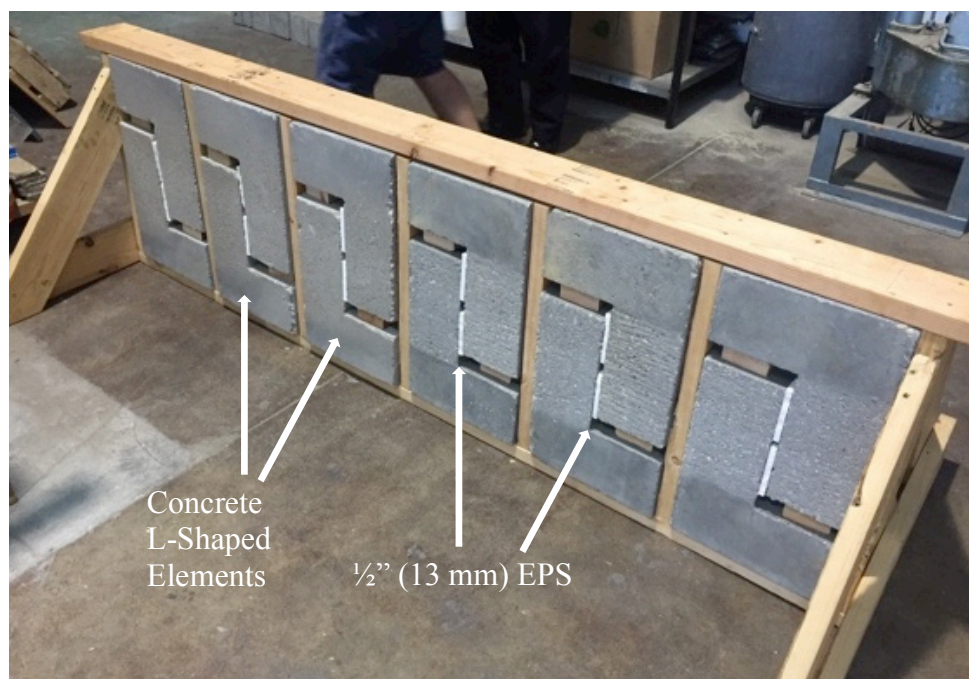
Step 1: Orient concrete L-Shape elements.
